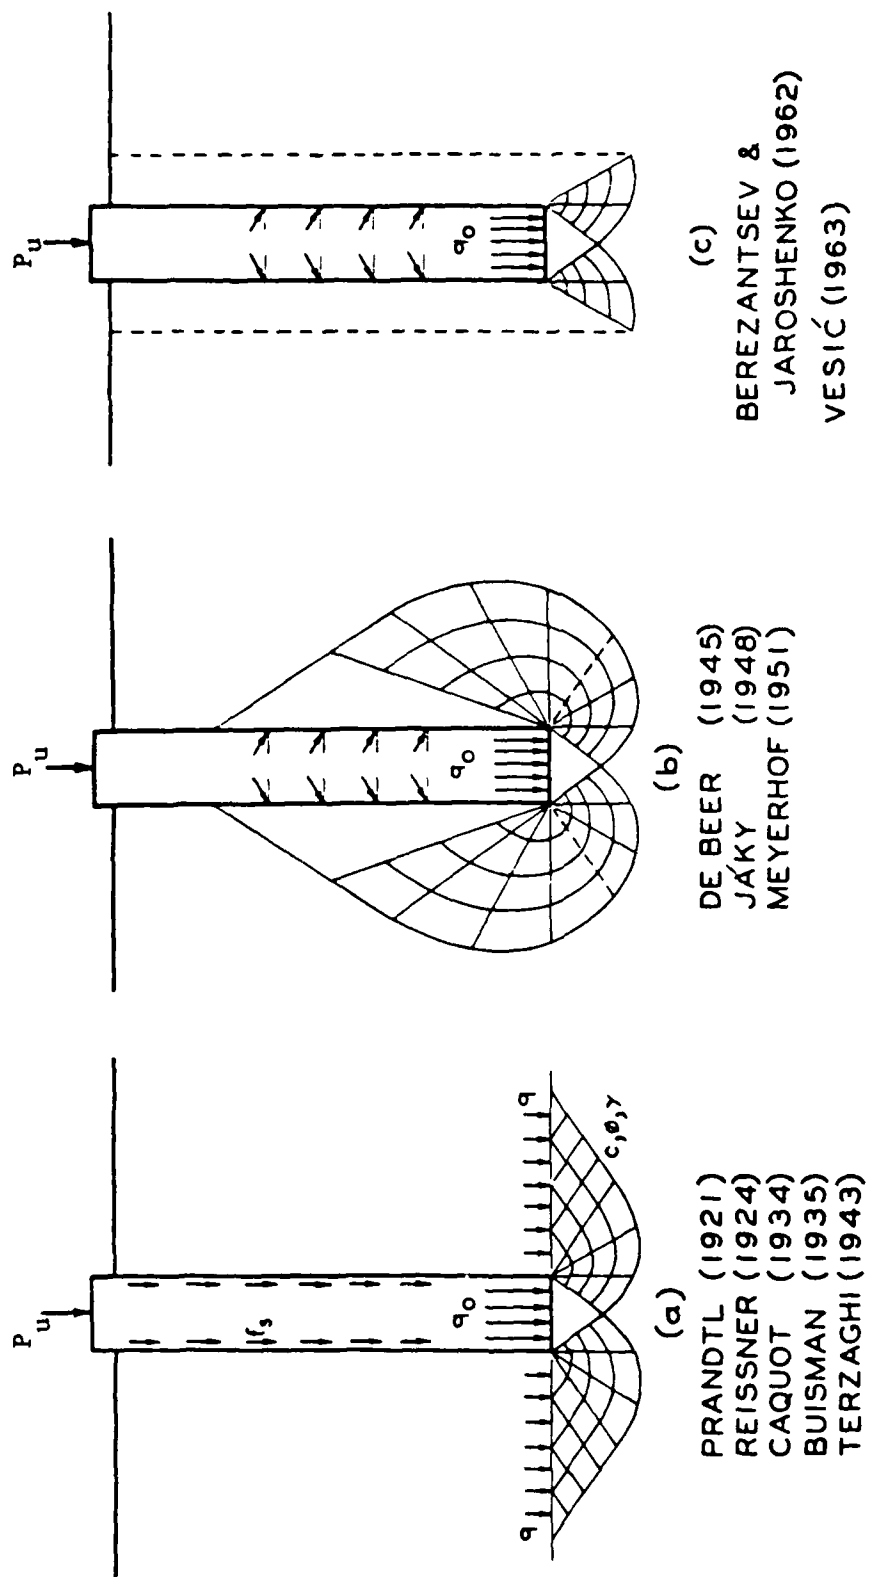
Pile Foundation Failure Patterns (Vesic 1967)
